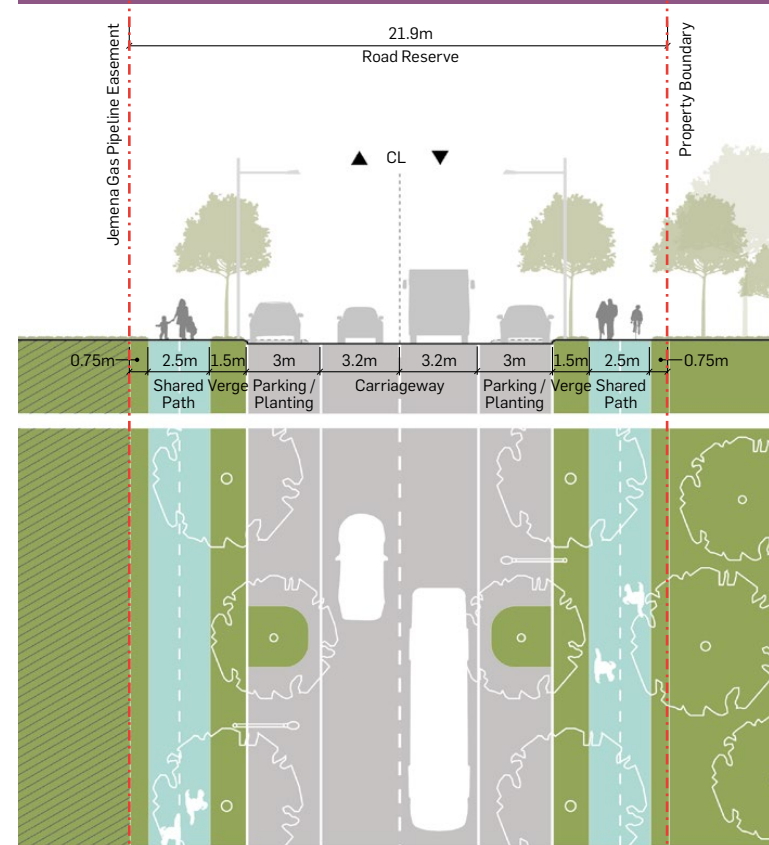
Indicative Street Section B-B' - Major Collector Road - Type 3
